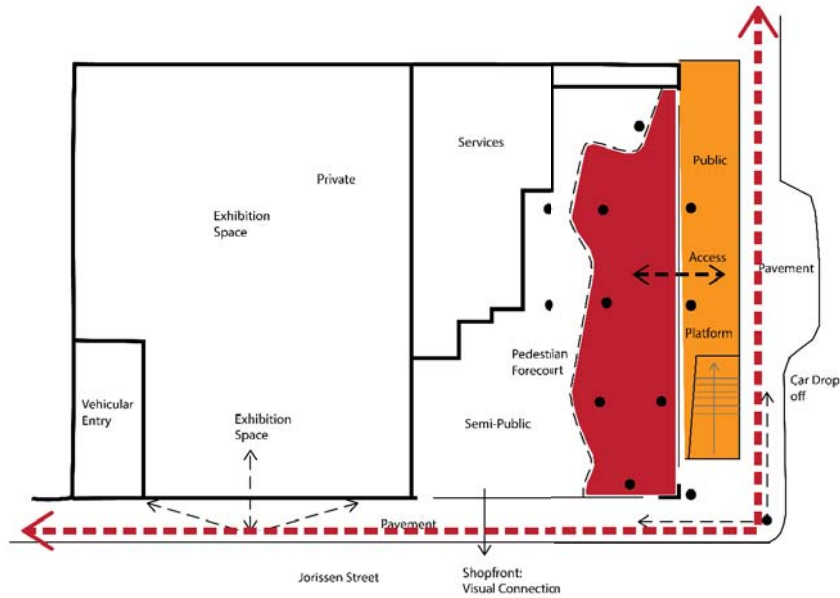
16 : Ground Floor plan Diagram,WAM, Johannesburg
